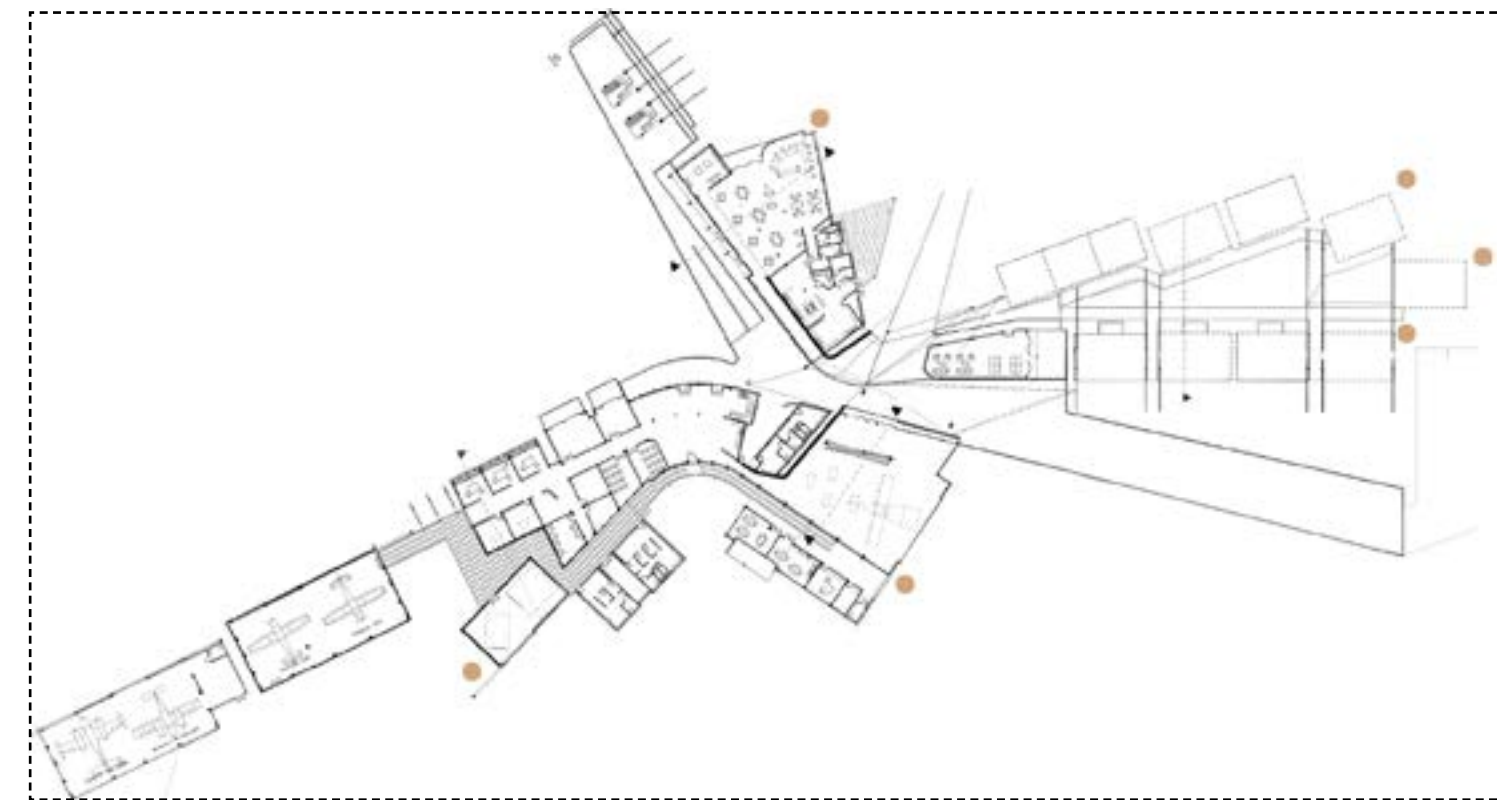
B: Water harvesting tanks layout on plan (Author, 2021)
